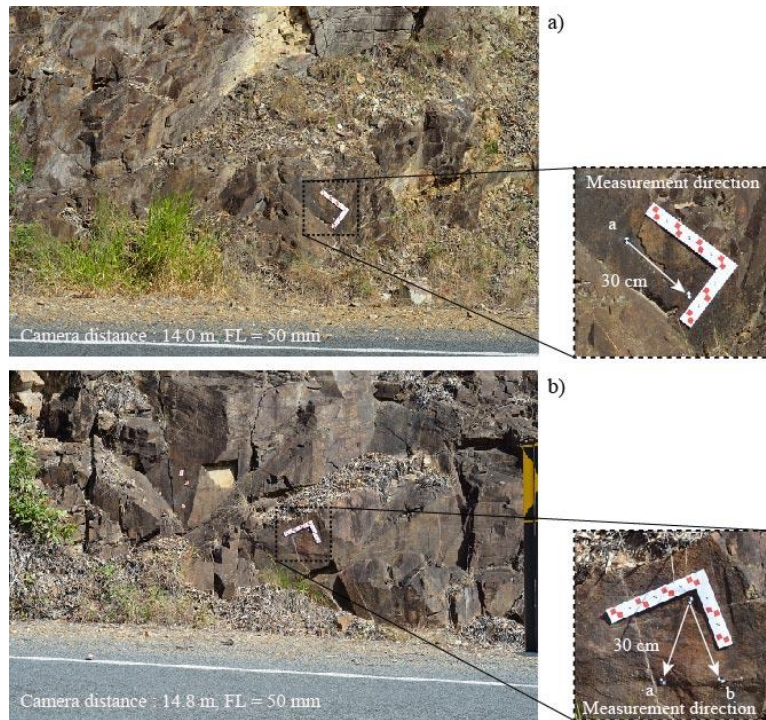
Study slope and measurement section; section a (a), section b (b) (Site #2. Nerang-Murwillumbah road 1)
